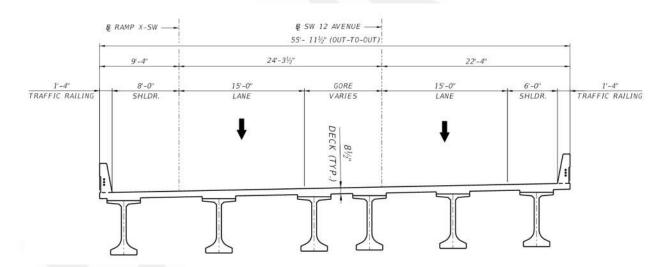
Bridge Typical Section (Bridge No. 6)
